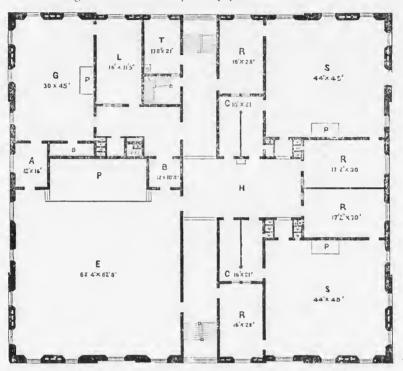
Plan of the Second Floor on Third Storey, adapted to Fig. 197.
